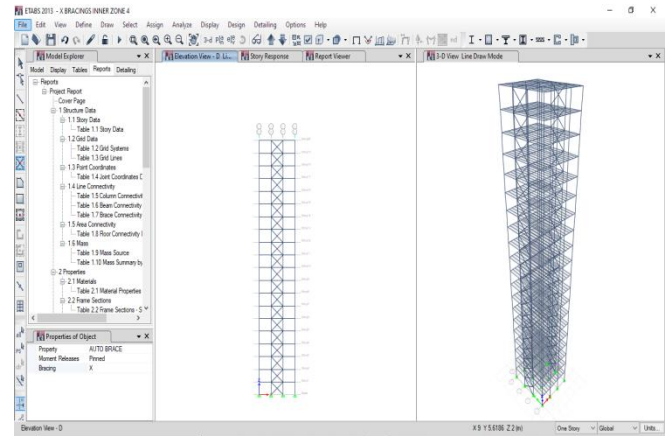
Elevation and 3D view of the building with X bracings at center bay
